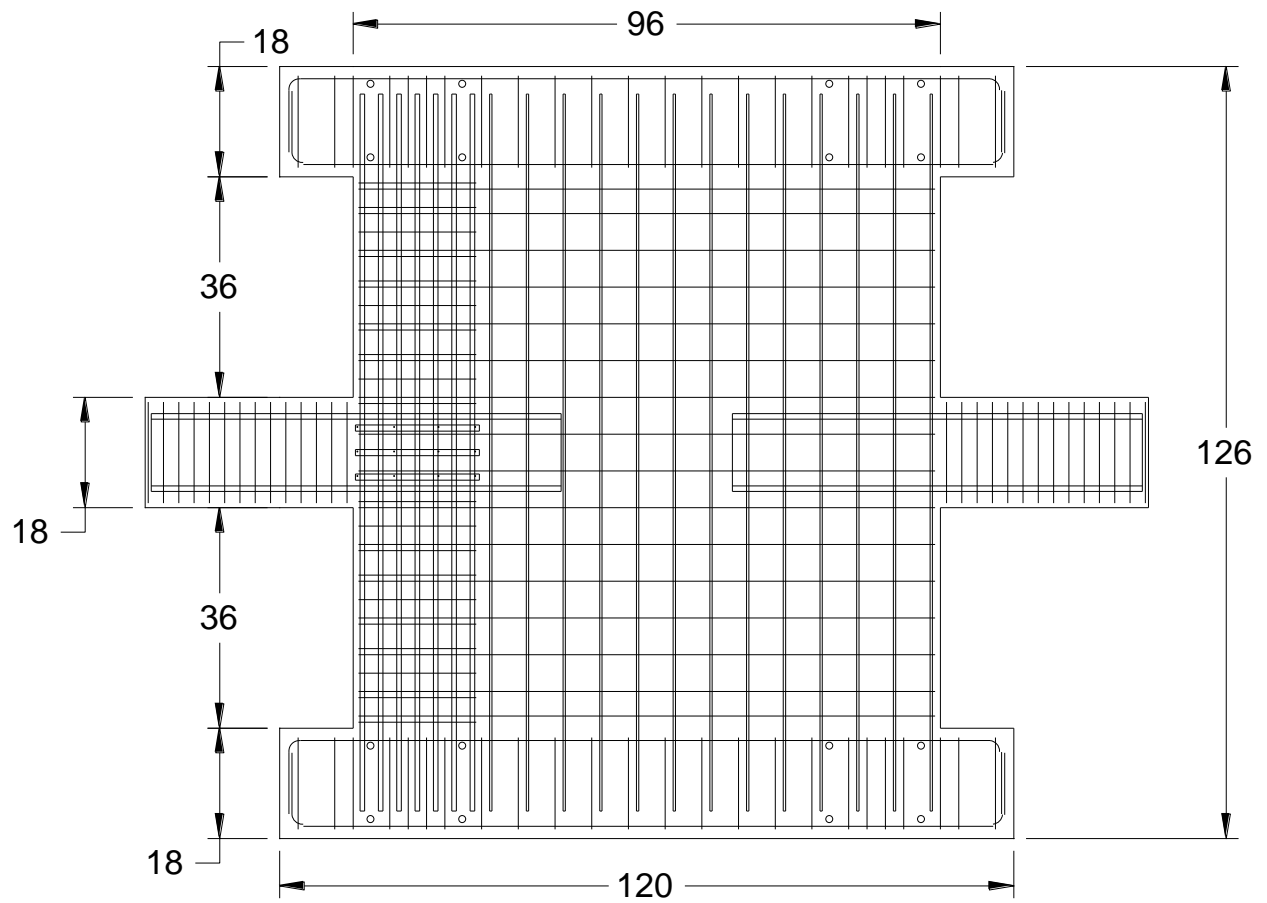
Elevation View of Test Specimen with SRC-W3 and SRC-W4
